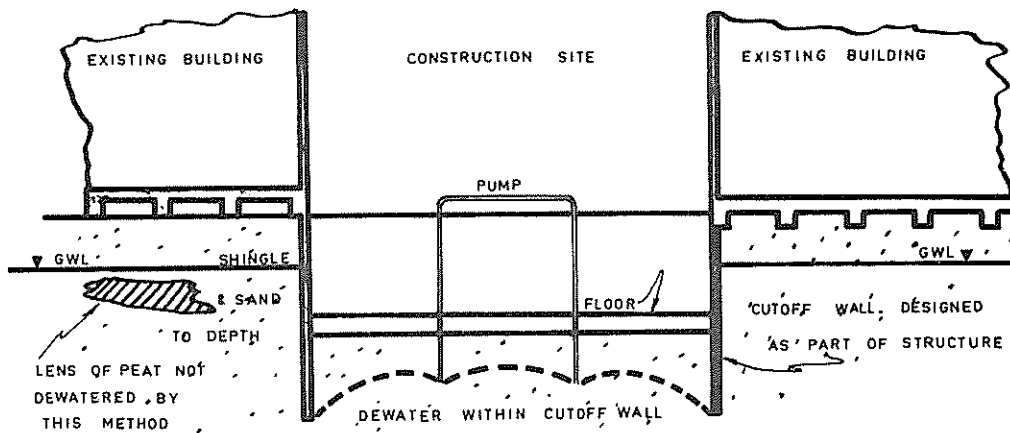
CAR PARK BASEMENT, SHOWING ALTERNATIVE METHOD OF DEWATERING WITHIN CUT OFF WALL
